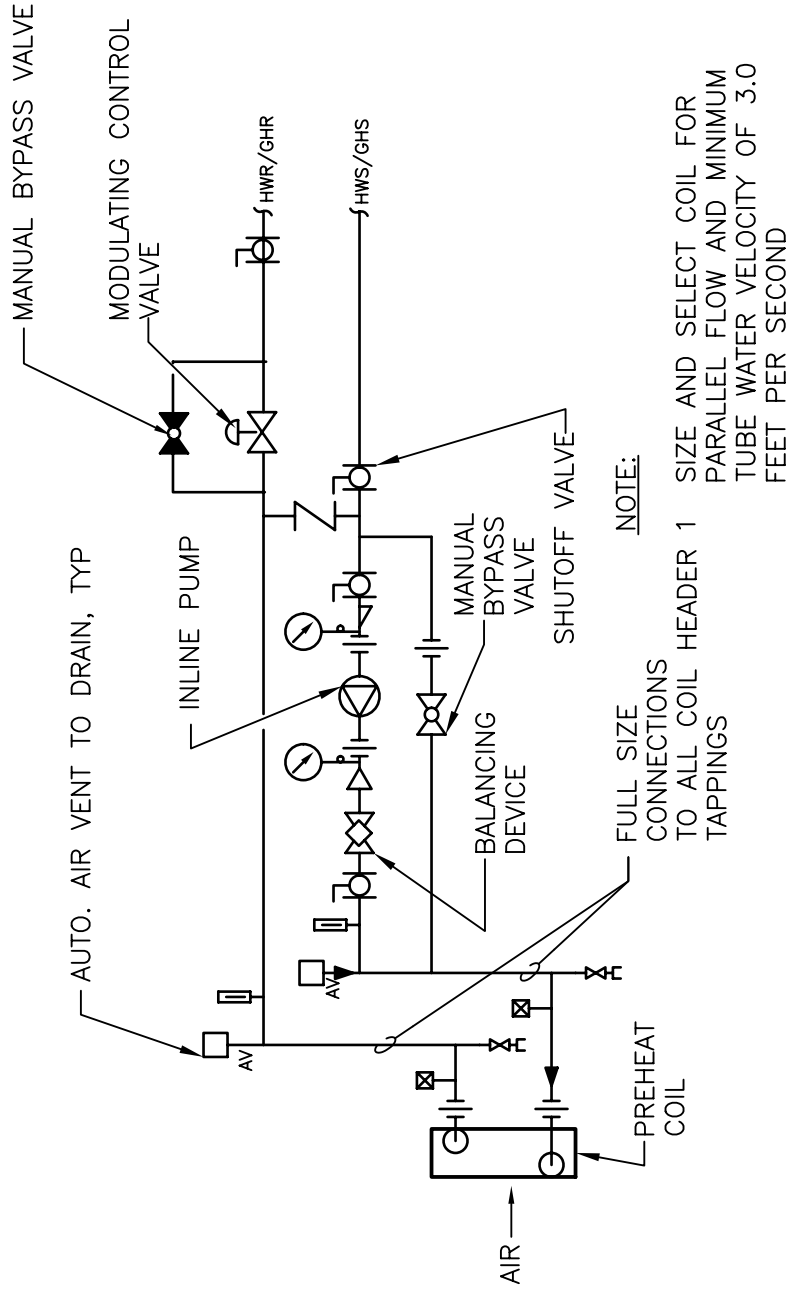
DETAIL TITLE / PREHEAT COIL (HOT WATER) - PIPING CONNECTIONS
